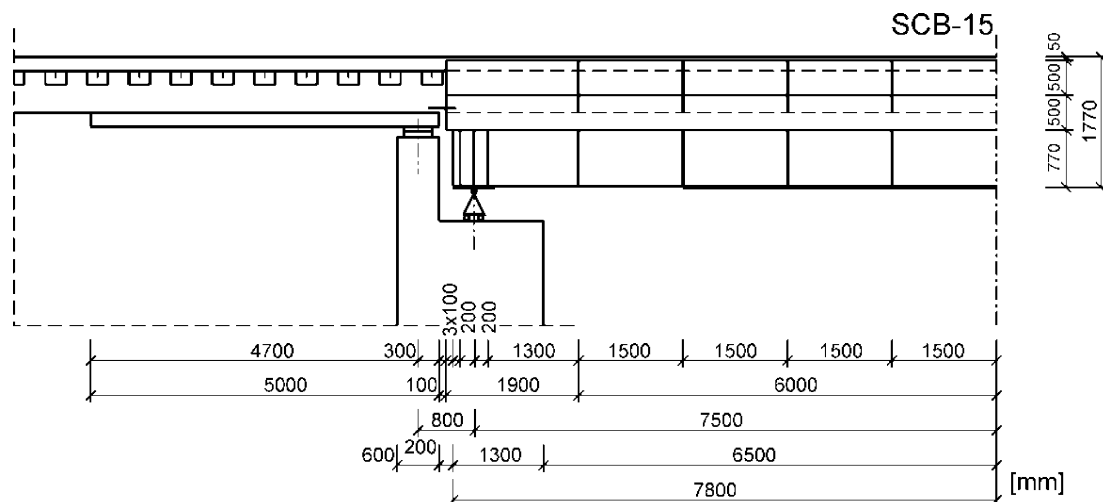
Longitudinal section of symmetric bridge SCB-15 and of transient zone part
